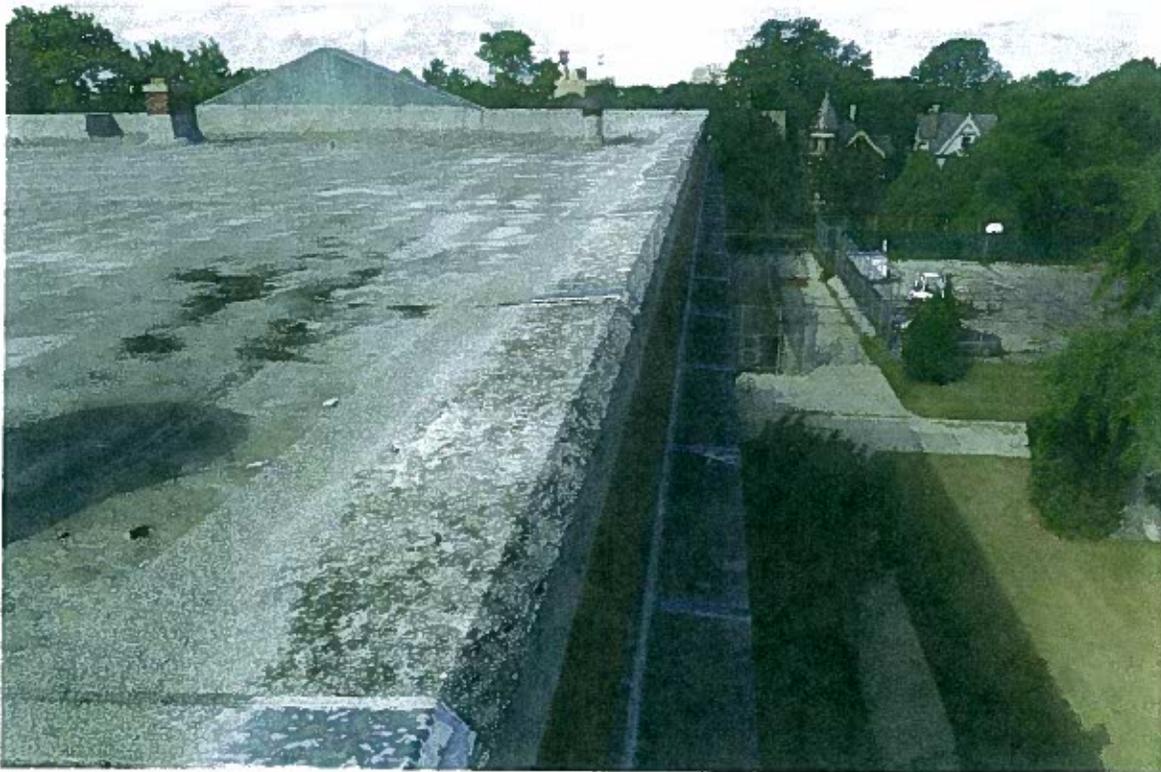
Parapet at north side. Spar-on roofing and insulation run up the entire roof side of the parapet and half way up the coping. This has trapped moisture within the parapets, causing advanced mortar and stone decomposition.
